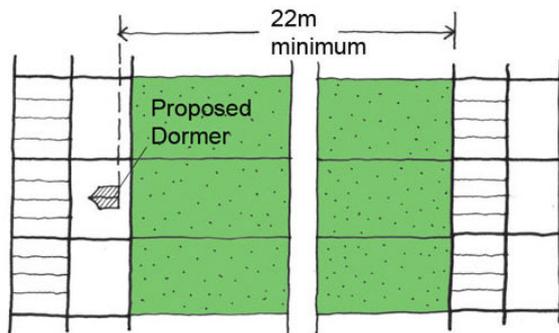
Proposed dormer windows should leave at least 22m distance away from the rear habitable rooms of the neighbouring properties.
